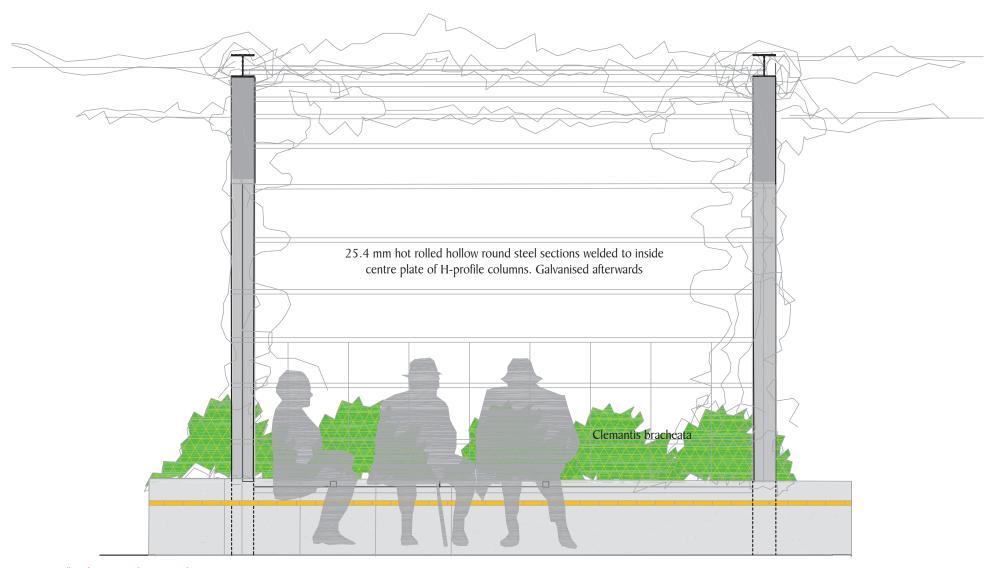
Trellis. Elevation. Scale 1:25 (Author, 2008)
